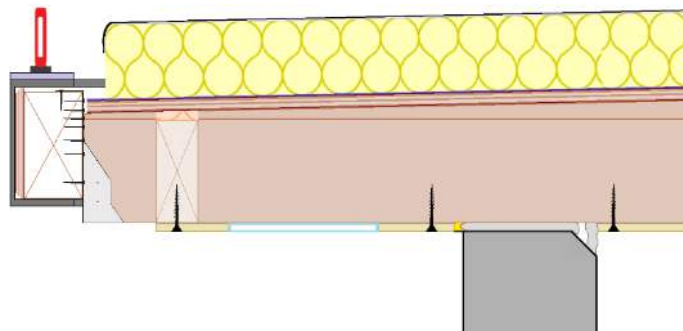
Front wall detail showing how the seal was achieved on the unexposed side of the compartment wall using plasterboard and a glass viewing pane. Note: For clarity, the indicative compartment wall, rising off the front wall of the furnace is not shown
